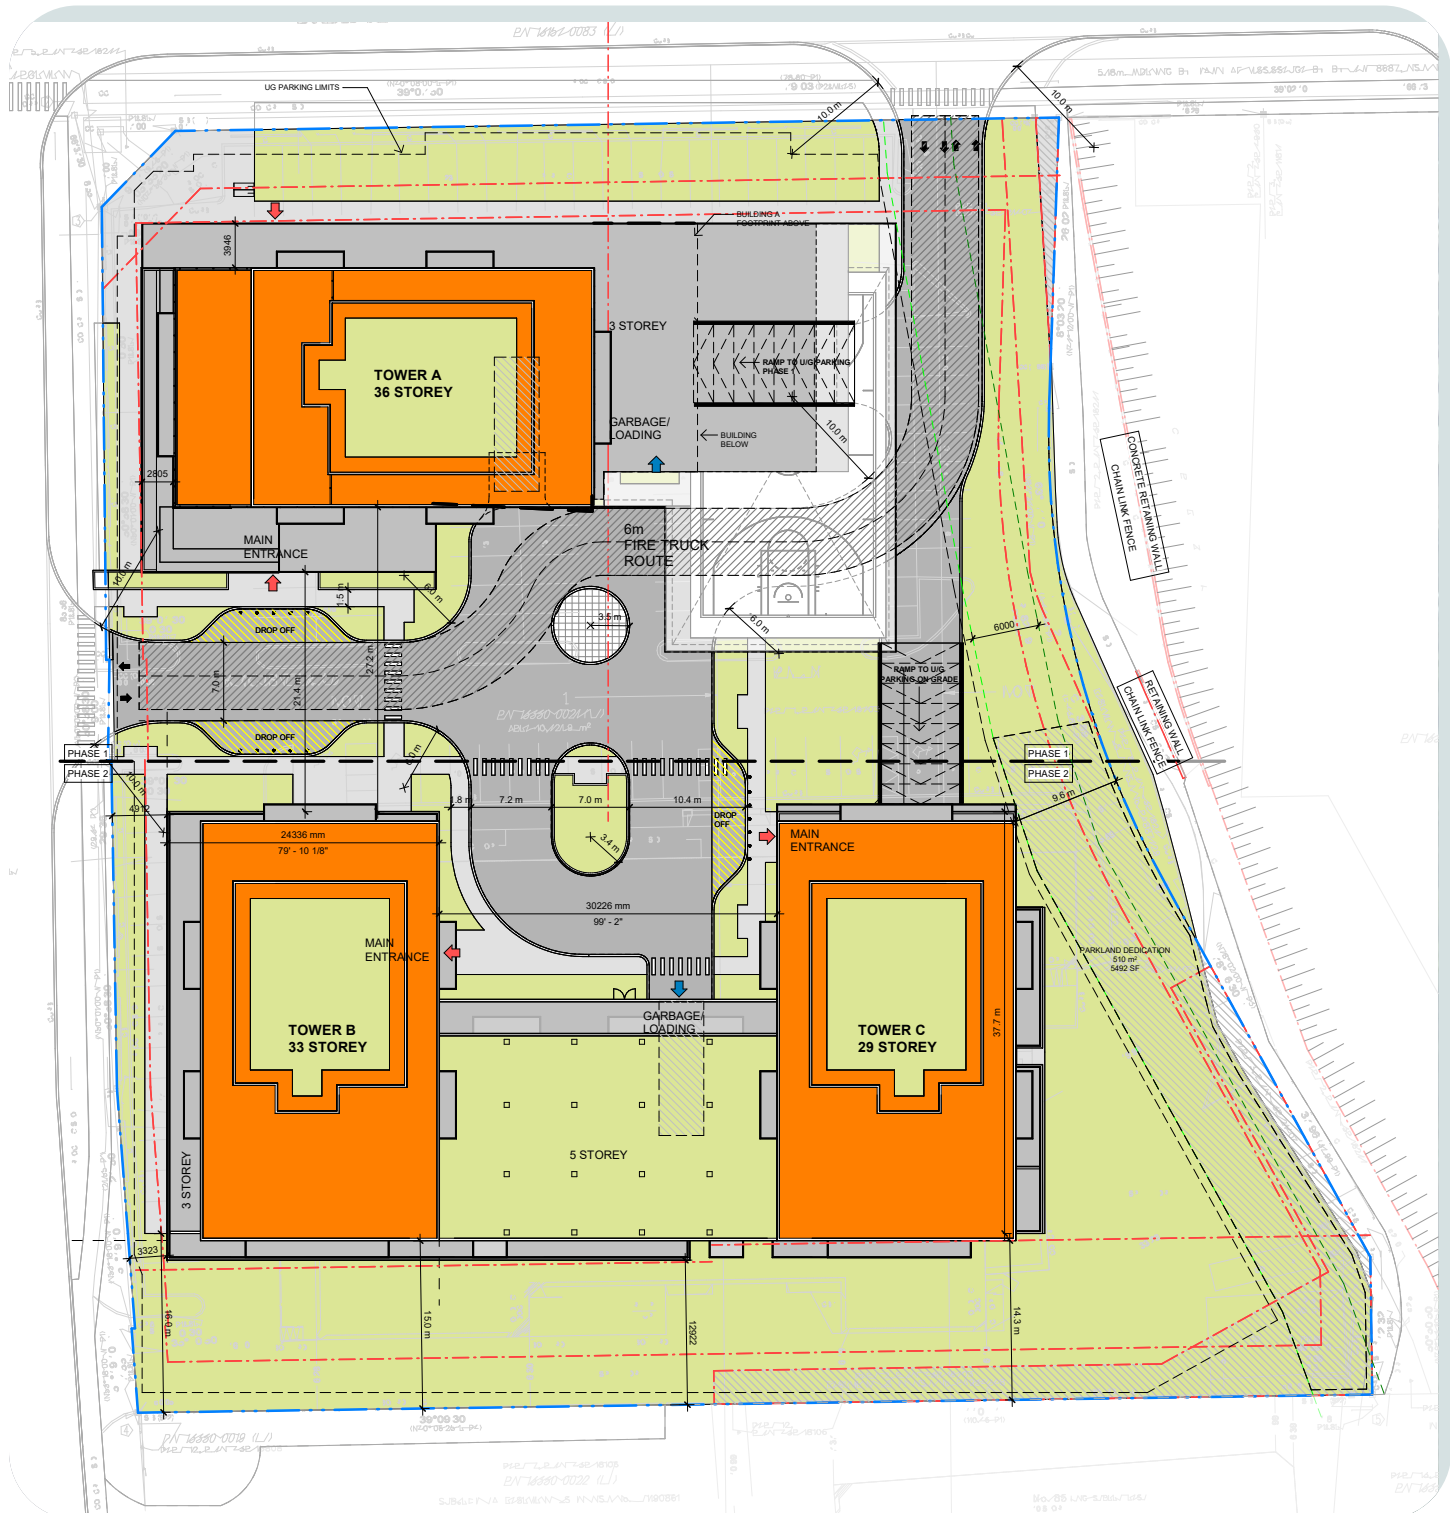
Site Plan (Prepared by: Chamberlan Architects)
